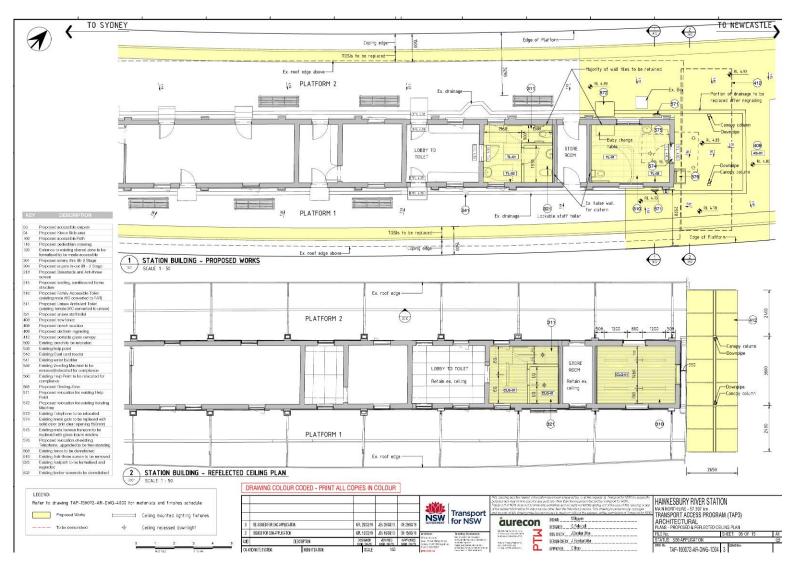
Plan view of proposed changes to the current male and female toilets within the station building.
